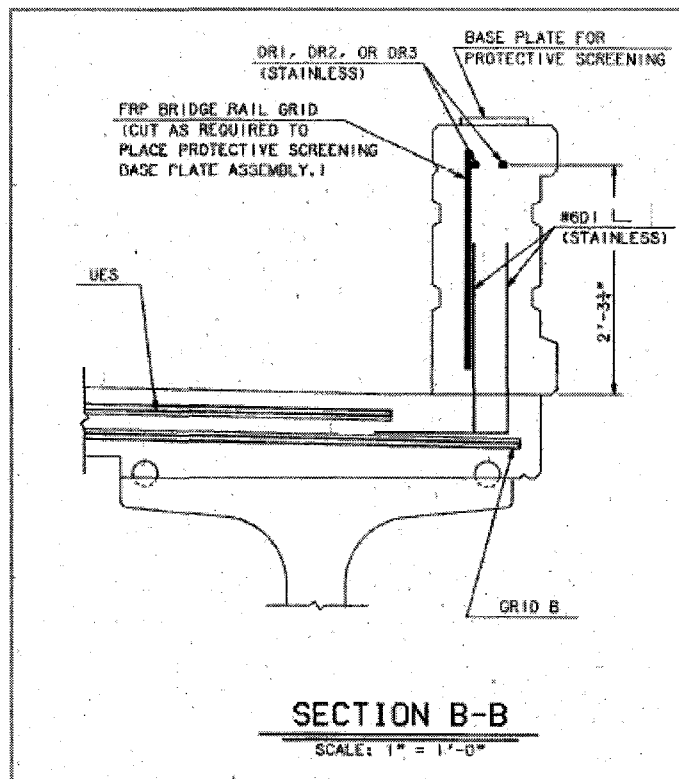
Section view of bridge rail connection to bridge deck (NHDOT Bureau of Bridge Design, 1999)
